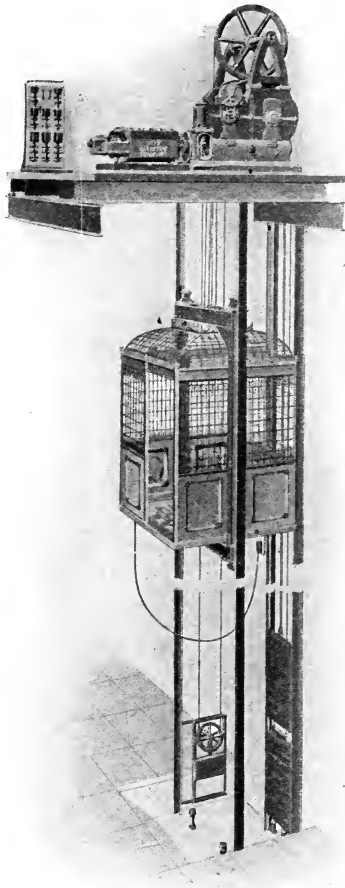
Electric Elevator with Overhead Driving Mechanism.
